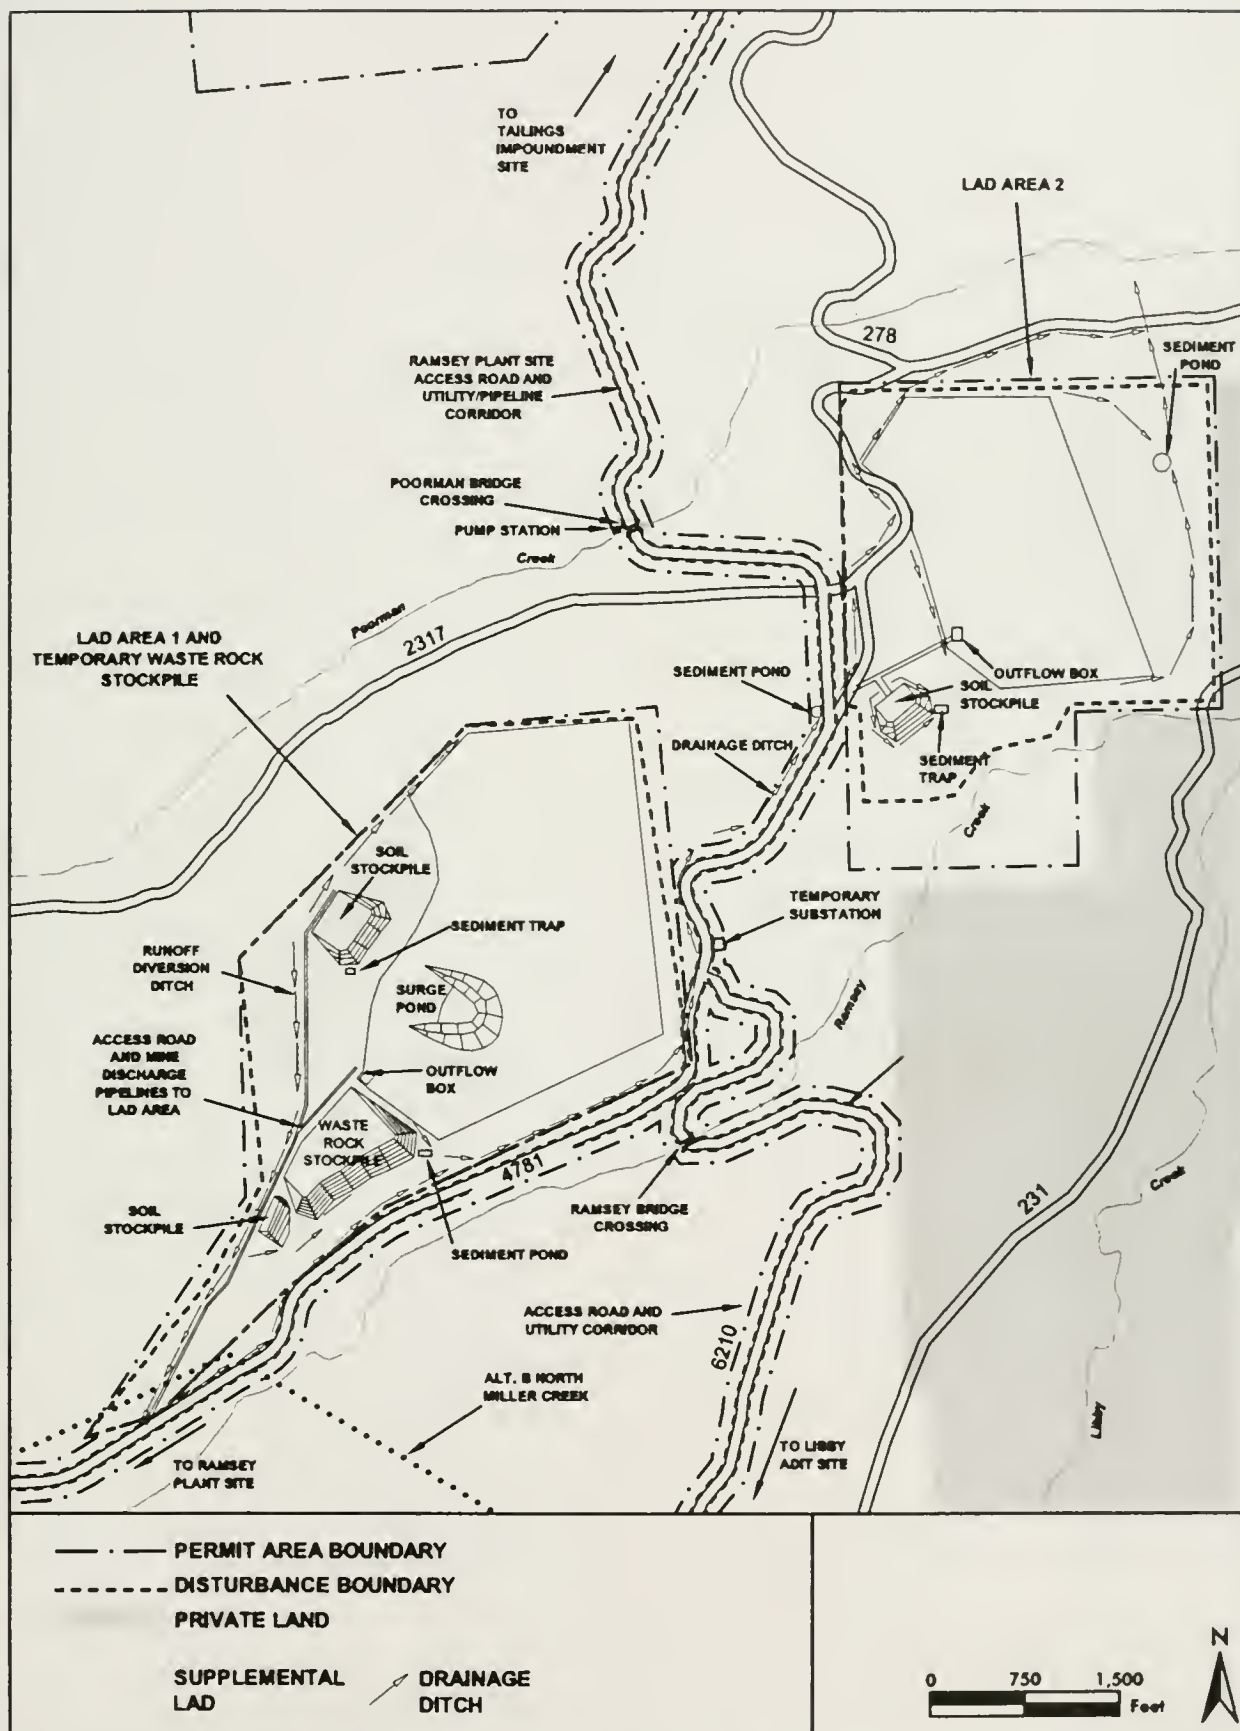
LAD Areas 1 and 2 and Waste Rock Stockpile, Alternative 2
